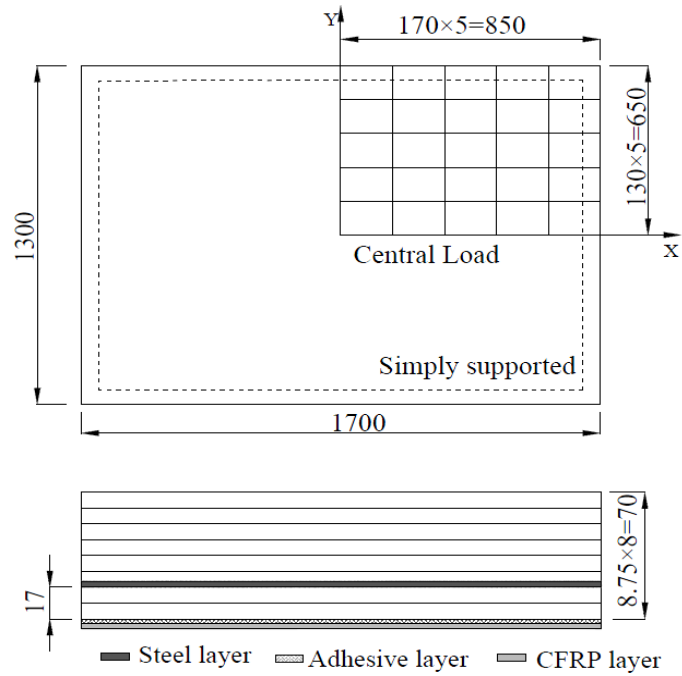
The physical model of Slab 3 [2] (dimensions: mm)
